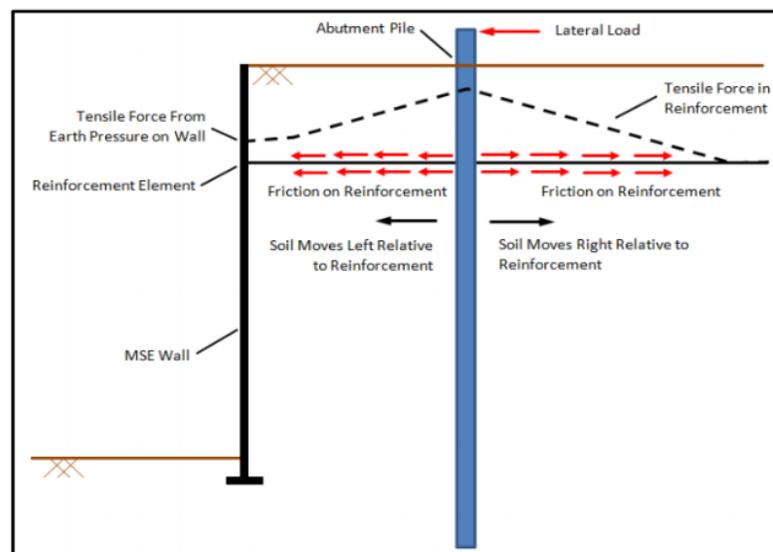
Interaction between soil and soil reinforcements when a pile is laterally loaded (Han, 2014)
